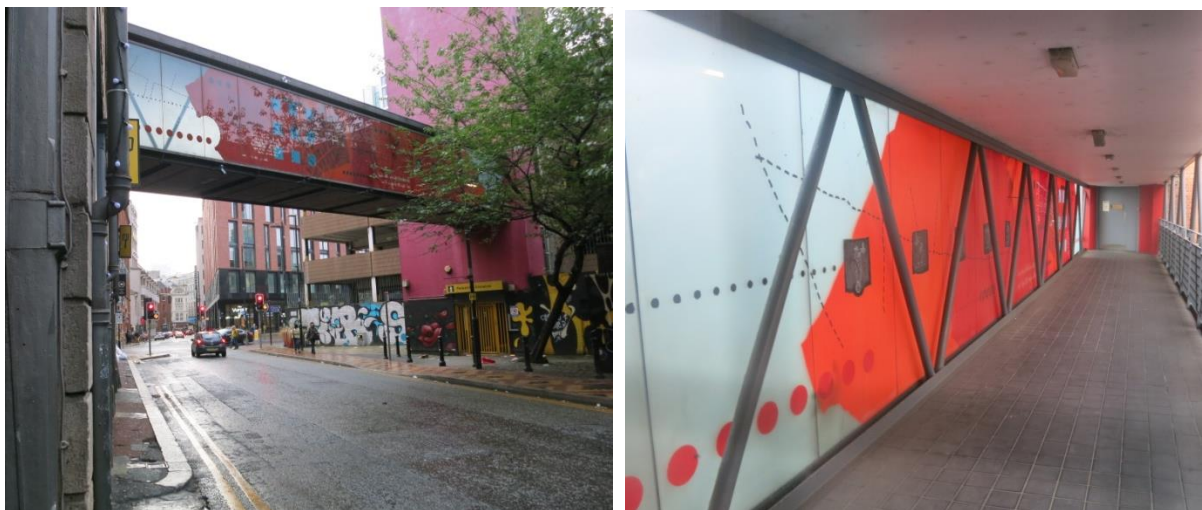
Tib Street Bridge Link (Martin Donlin; Stephenson Bell Architects, 1999), Manchester, UK; A – View with the street background; B – Façade detail.
